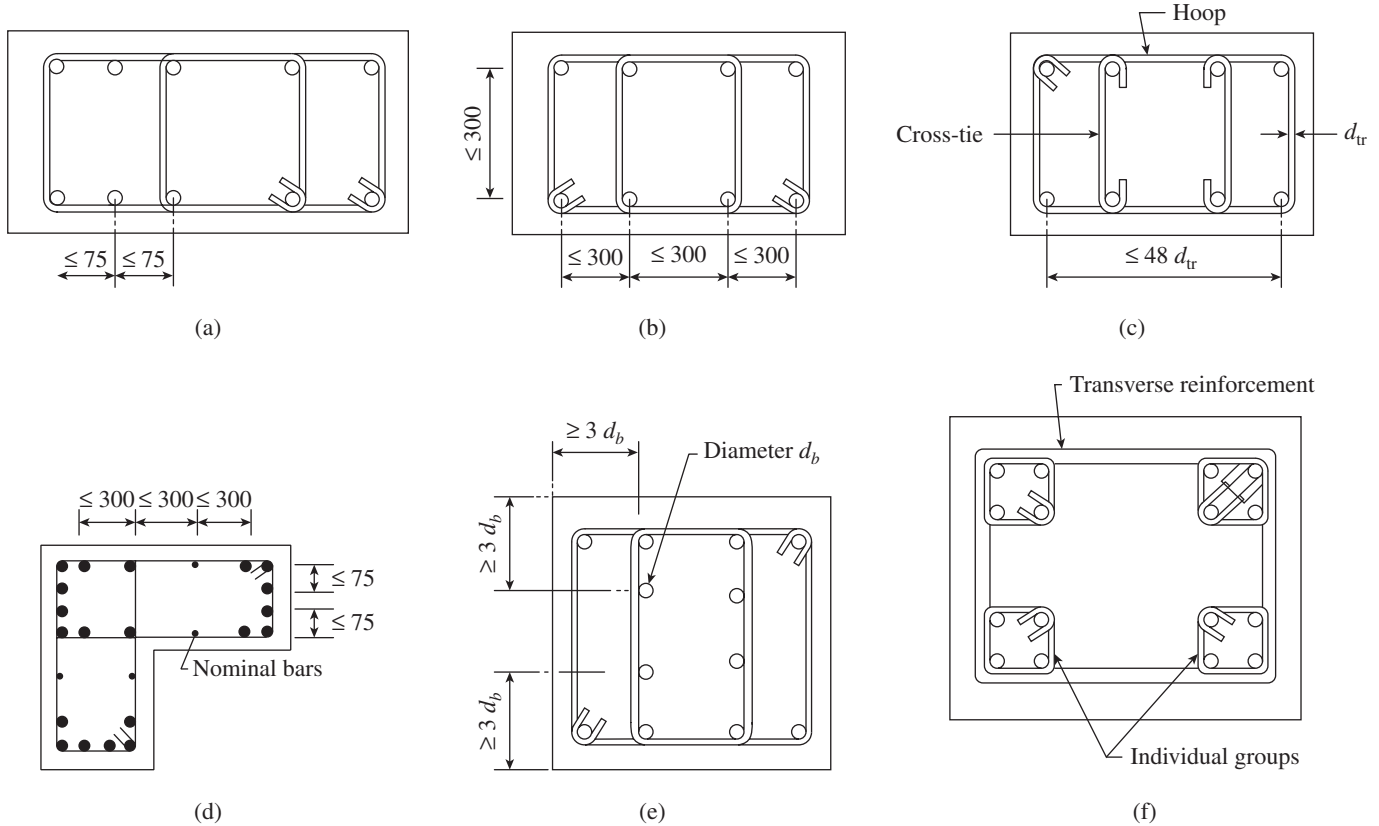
Different types of arrangement of transverse reinforcement (a) Two overlapping hoops (b) Two overlapping hoops (not preferable) (c) Single hoops plus two cross-ties bent around longitudinal bars (d) T-shaped column (e) Longitudinal bars in more than one row (f) Grouping of longitudinal bars
